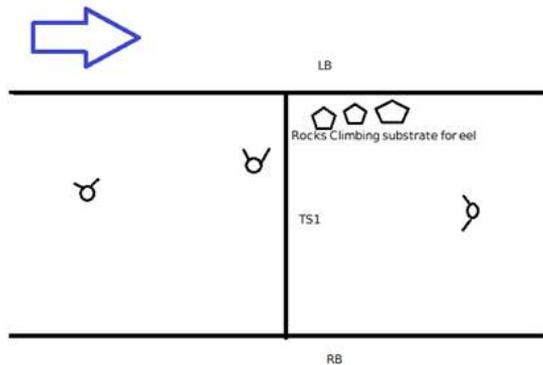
Site plan for Tidal Crane Barrier 3
